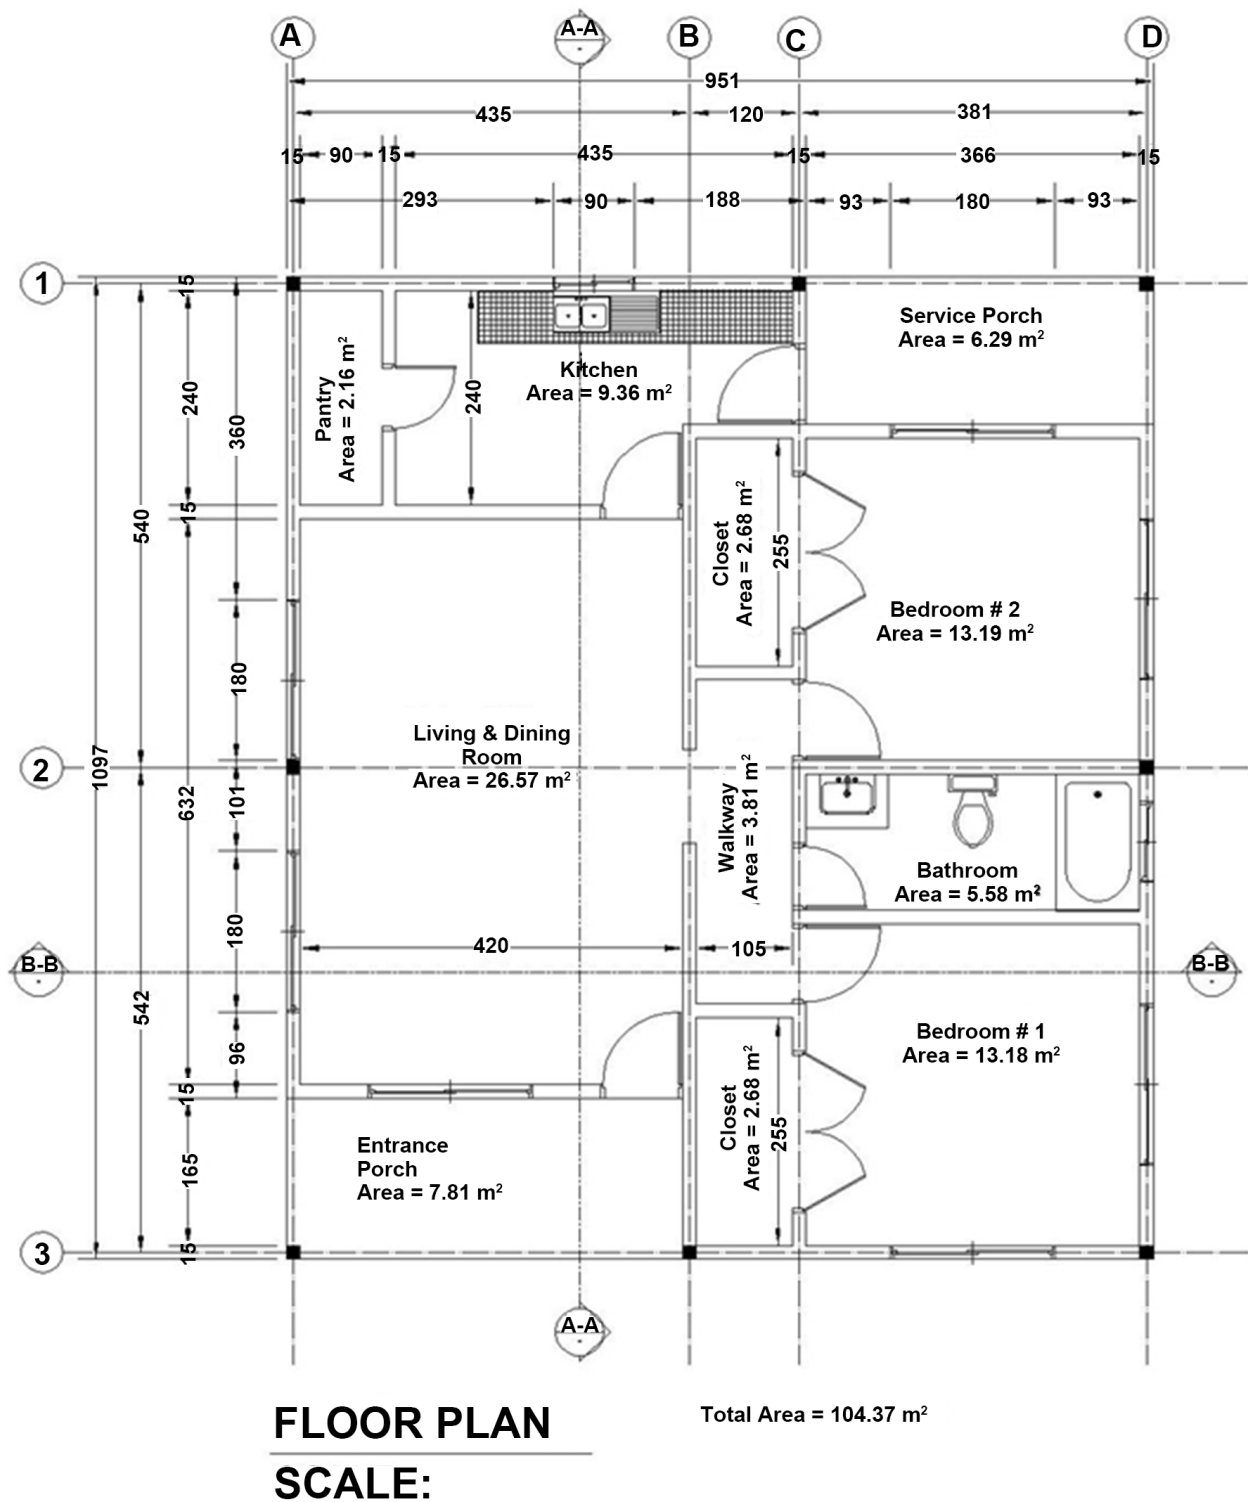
Typical floor plan of the 2-Bedroom single family Bungalow.
